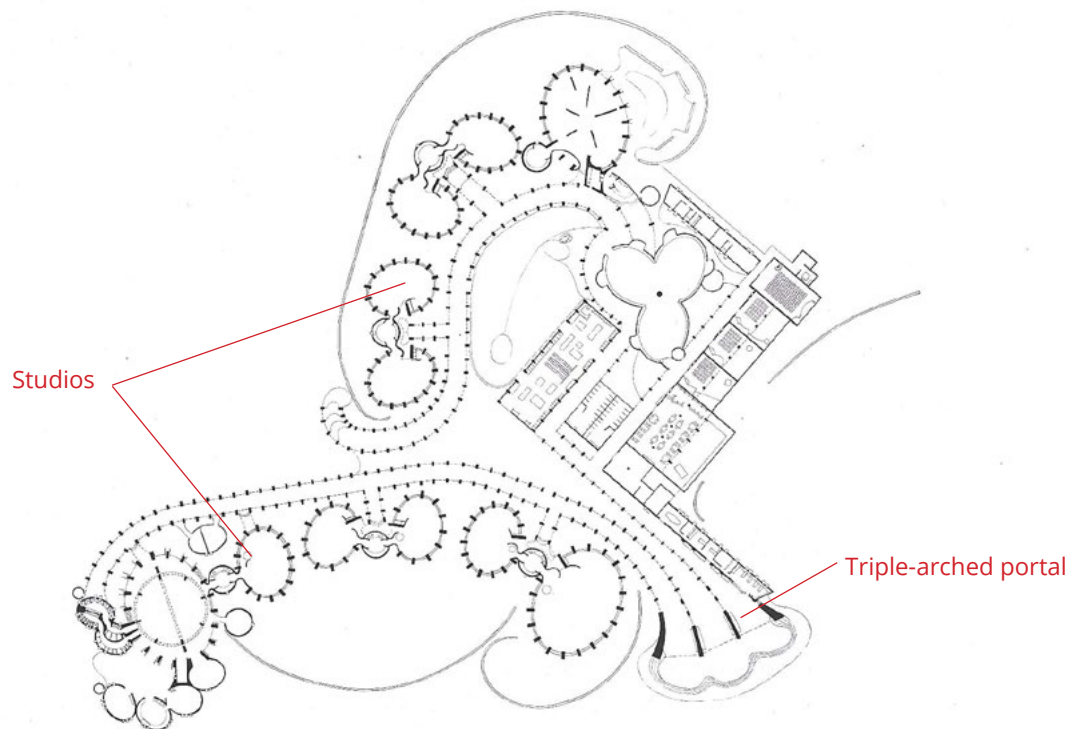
Vittorio Garatti, plan, School of Ballet, Havana, Cuba, 1961
